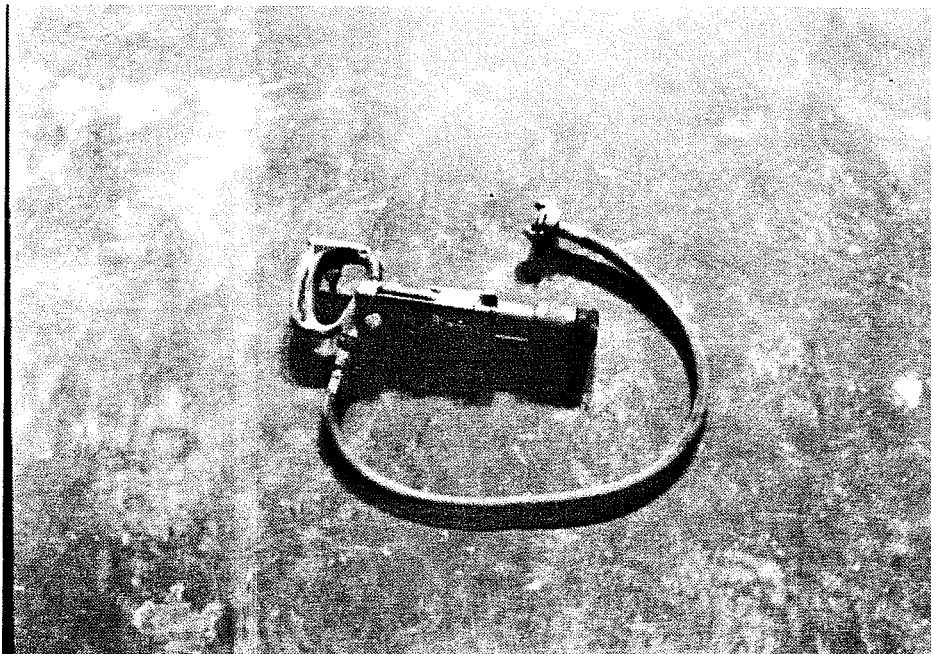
Air Drill Used to Drill Holes for Some Adhesive Anchors
